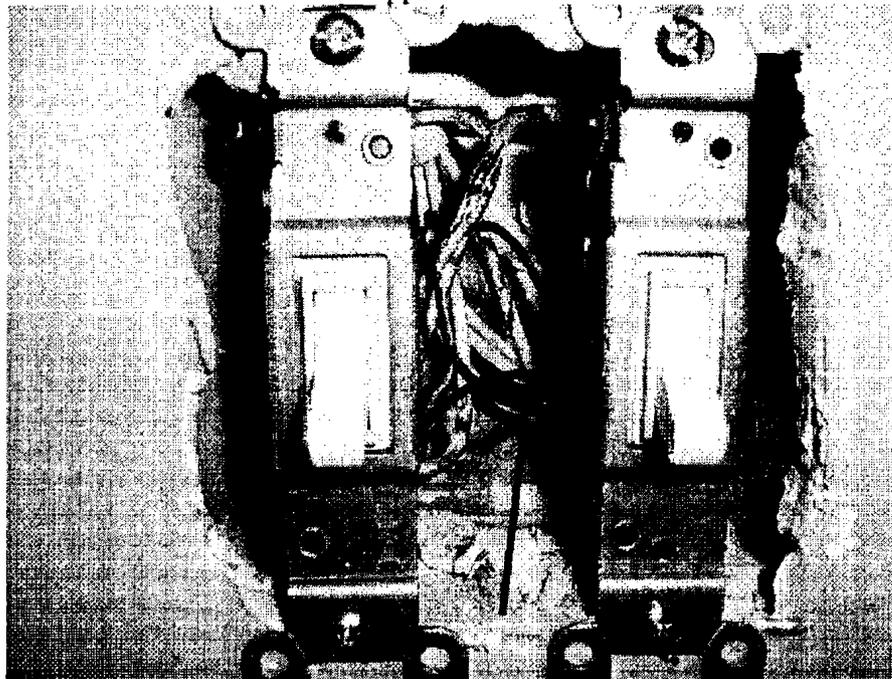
shows a view of a light switch located in a bathroom in the involved residence whose copper wiring has blackened.
